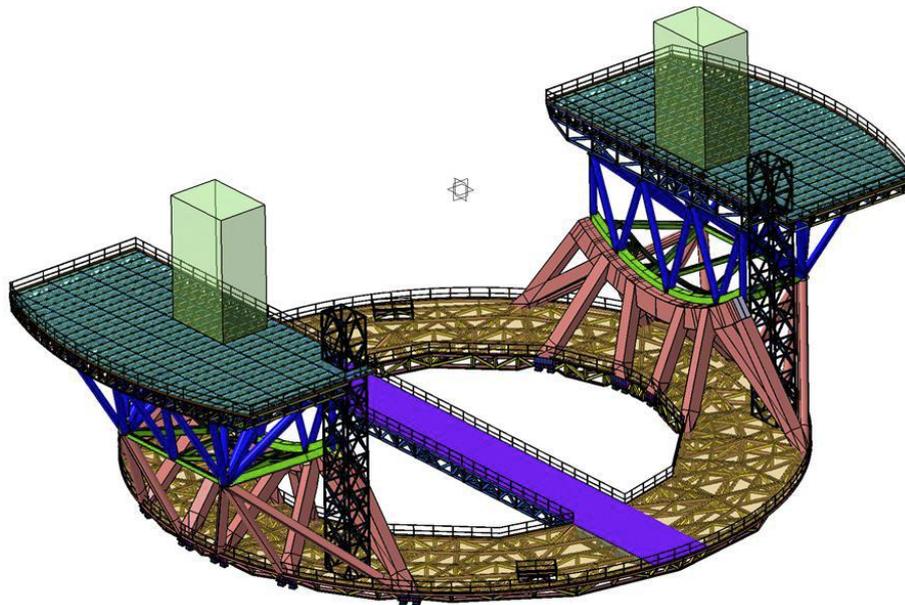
The azimuth structure and the floor for extracting hosted units.
